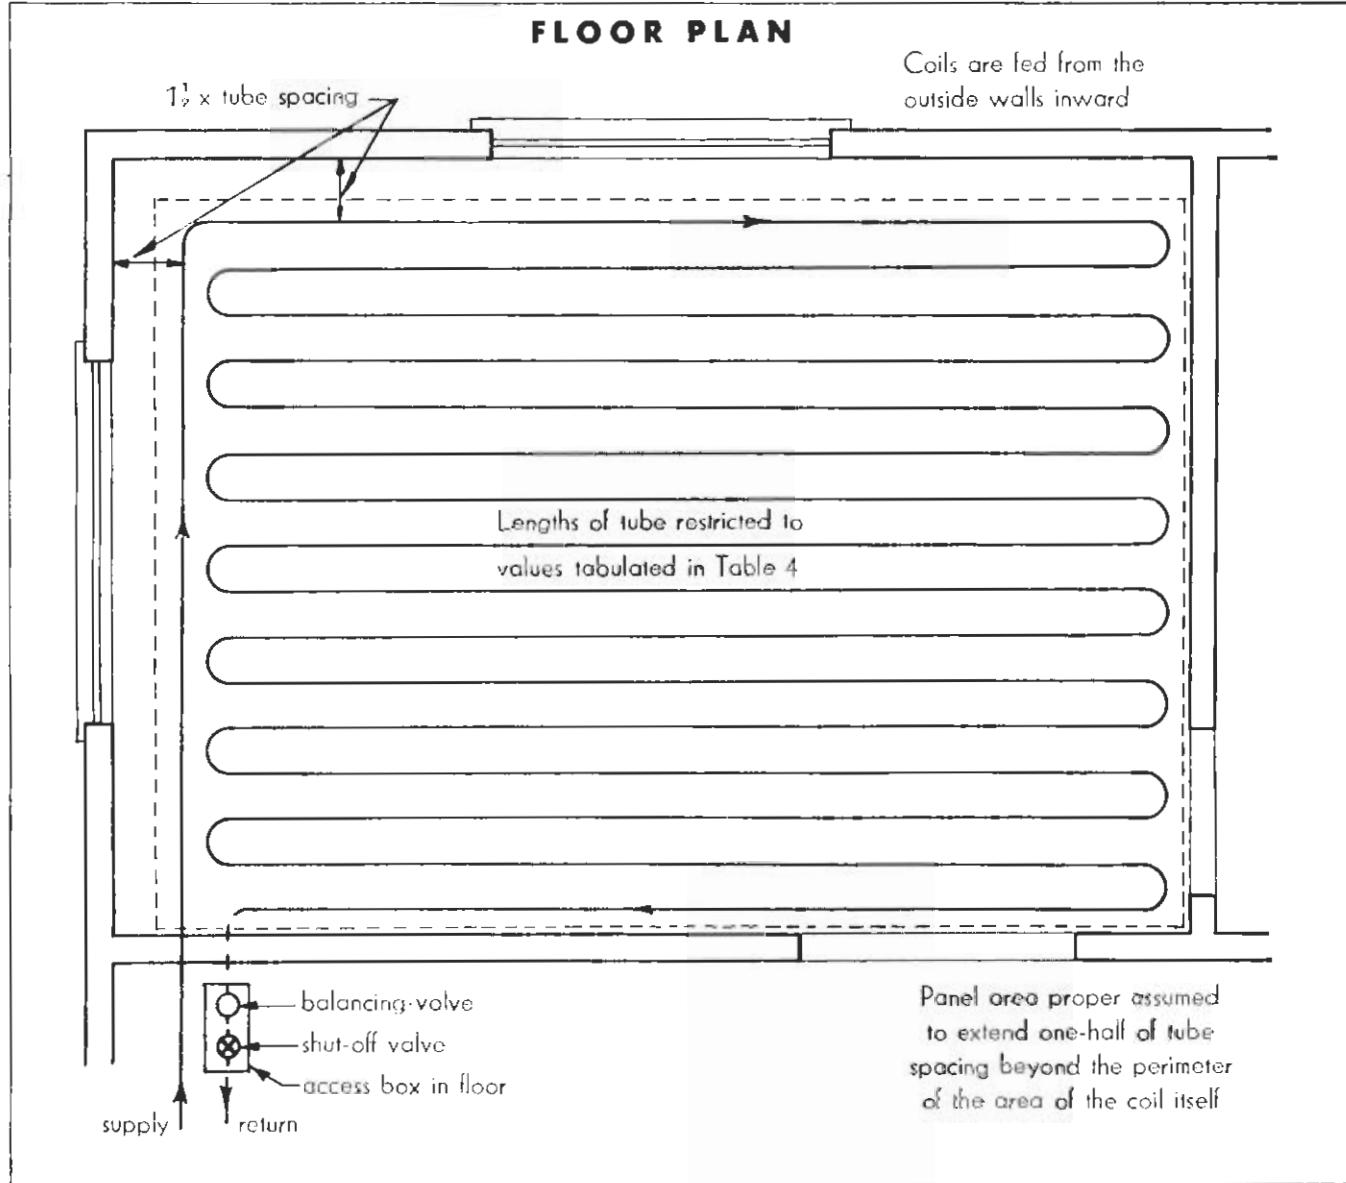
TYPICAL FLOOR PLAN CONSTRUCTION
